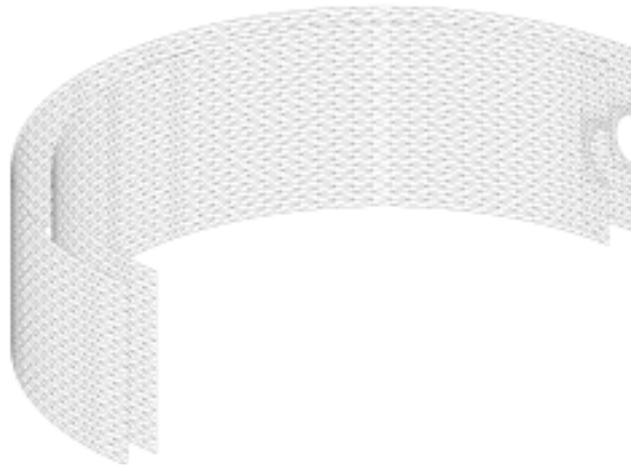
reinforcement modeled by orthotropic grid element (stirrup not modeled)
